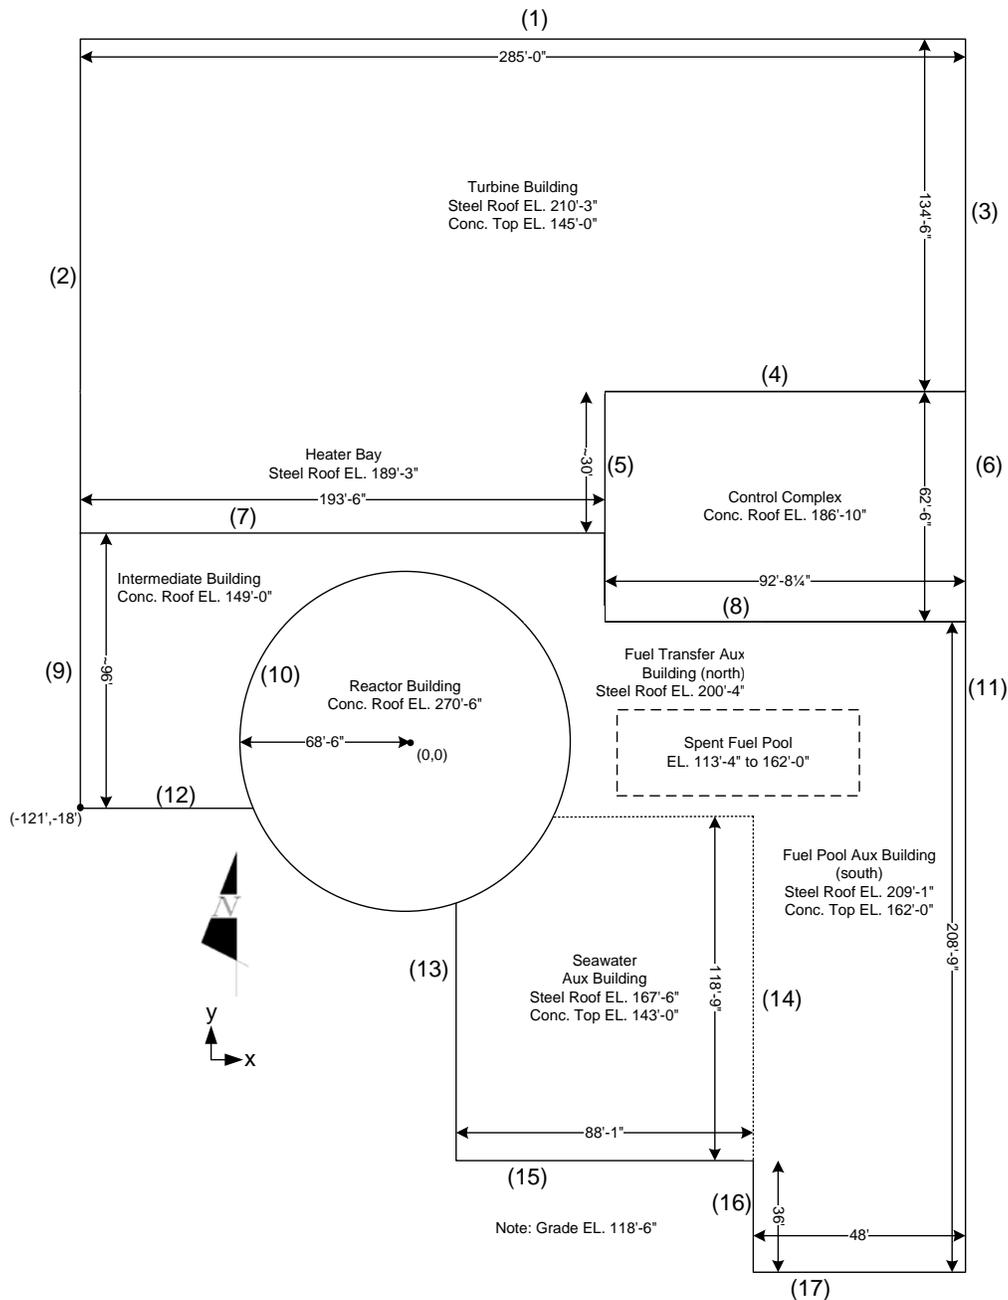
Plan view of CR-3 Buildings in Power Block
